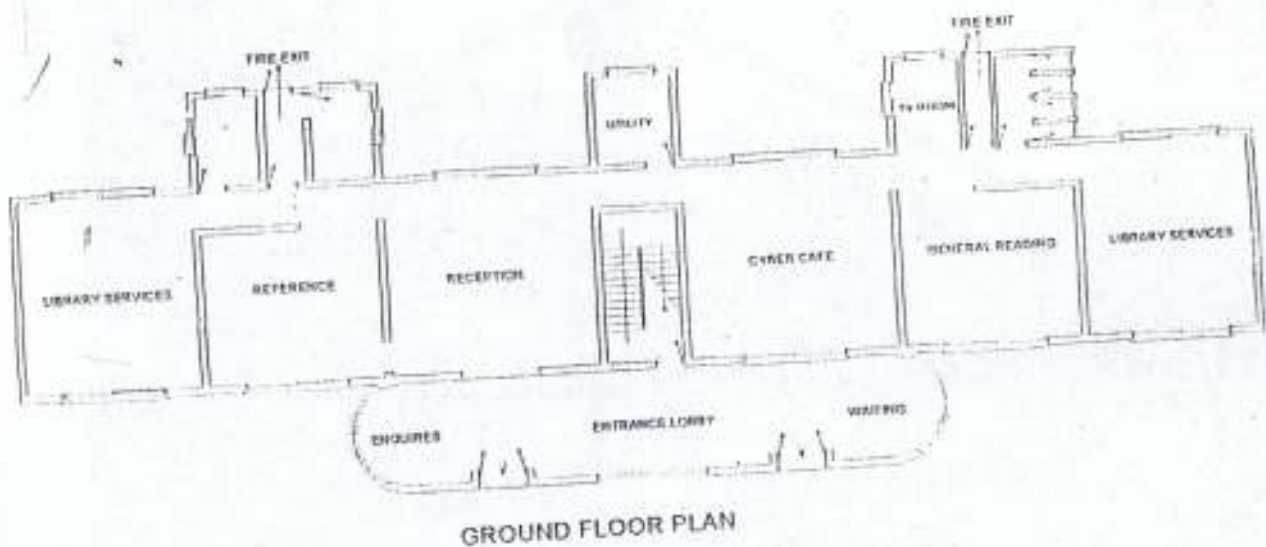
GROUND FLOOR PLANS OF BRITISH COUNCIL, LIBRARY
